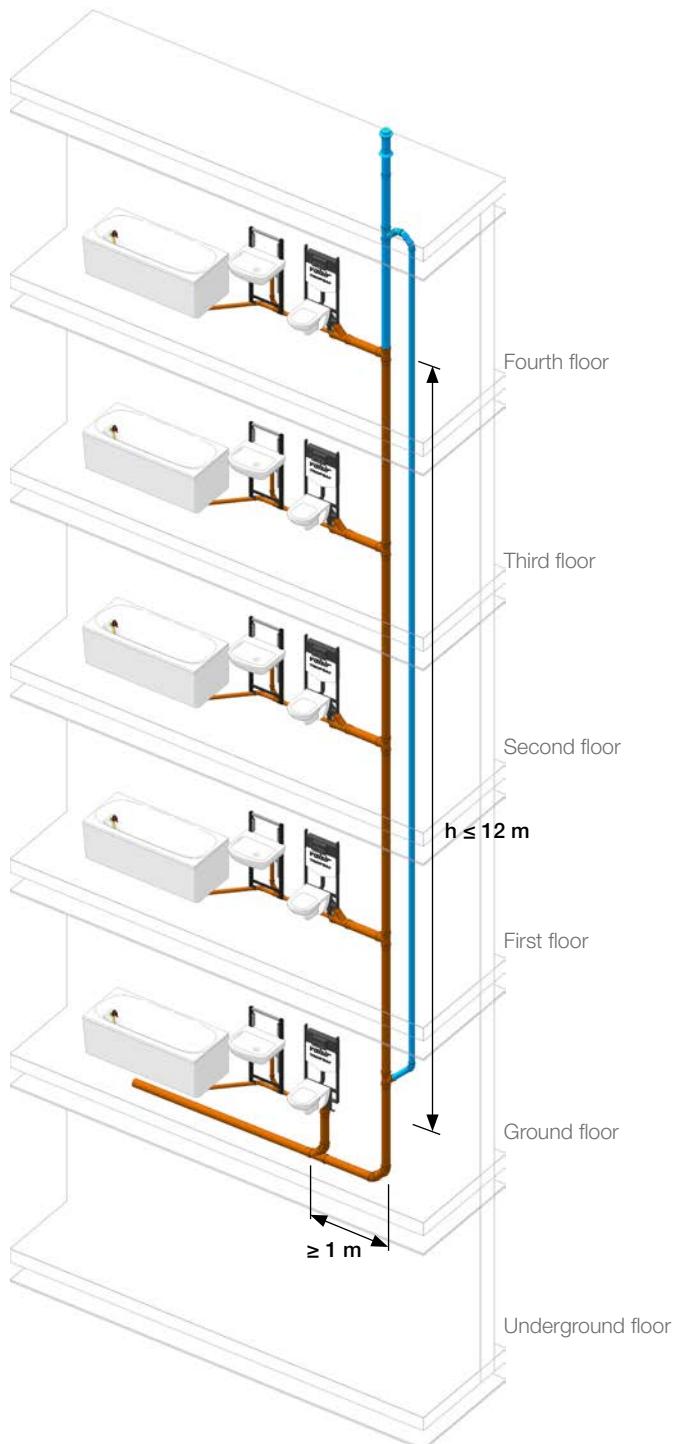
Direct parallel vent, 3÷5 storey building ($h \leq 12 \text{ m}$), collector in the ceiling of the underground floor.
